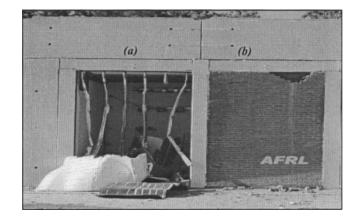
Posttest exterior views of BREW-1 (similar to W5): (a) EIFS façade; (b) brick façade
